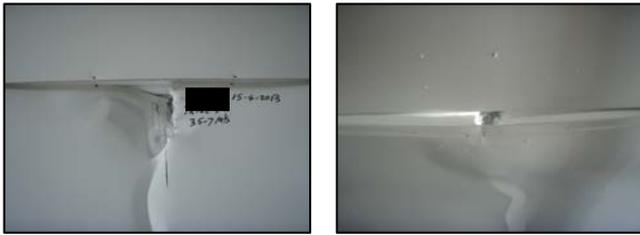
Impact location next to panel joint: front view (left); rear (right).
